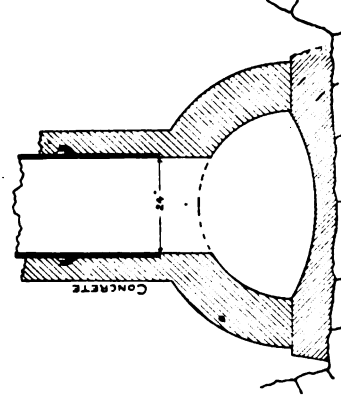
DETAILS OF OUTLET-GATE AND WELL-CULVERT OF LA MESA DAM.
